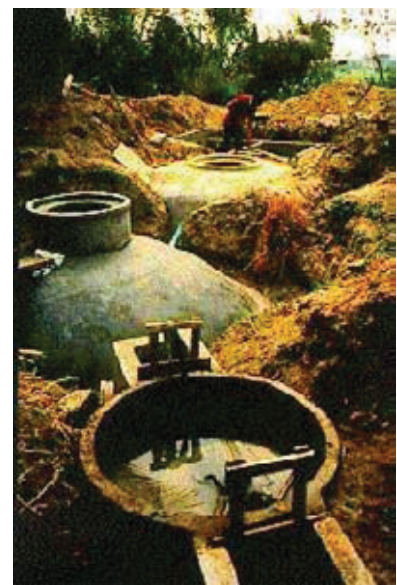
Installation of a fixed-dome plant in Thailand: The influent collecting tank is in front of the photo, the digester and the outlet are located behind it.
